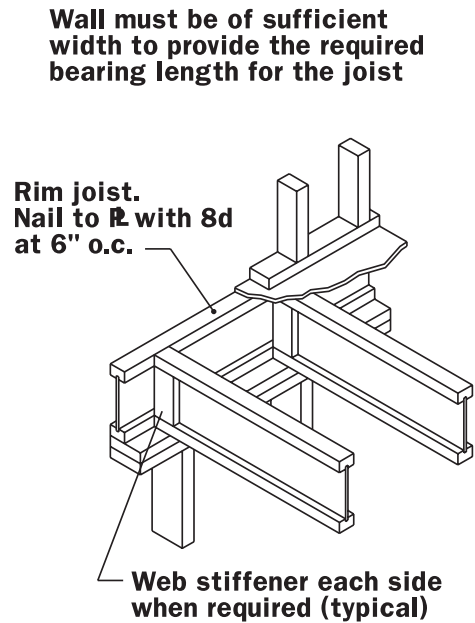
Continuous I-Joist Over a Bearing Wall Supporting a Wall Above
